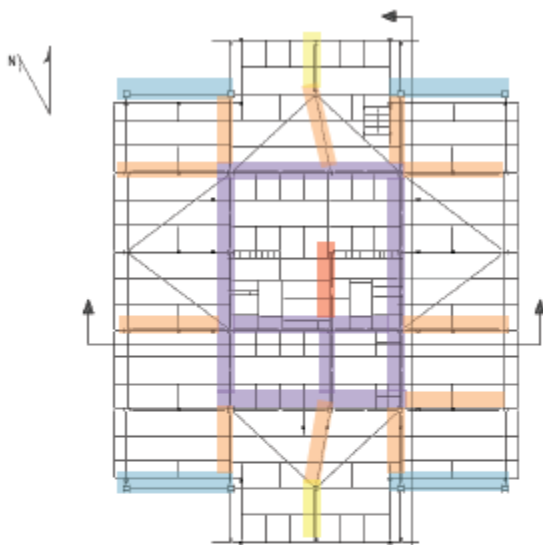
Mechanical Floor Framing Plan (Floors 28 & 51)
